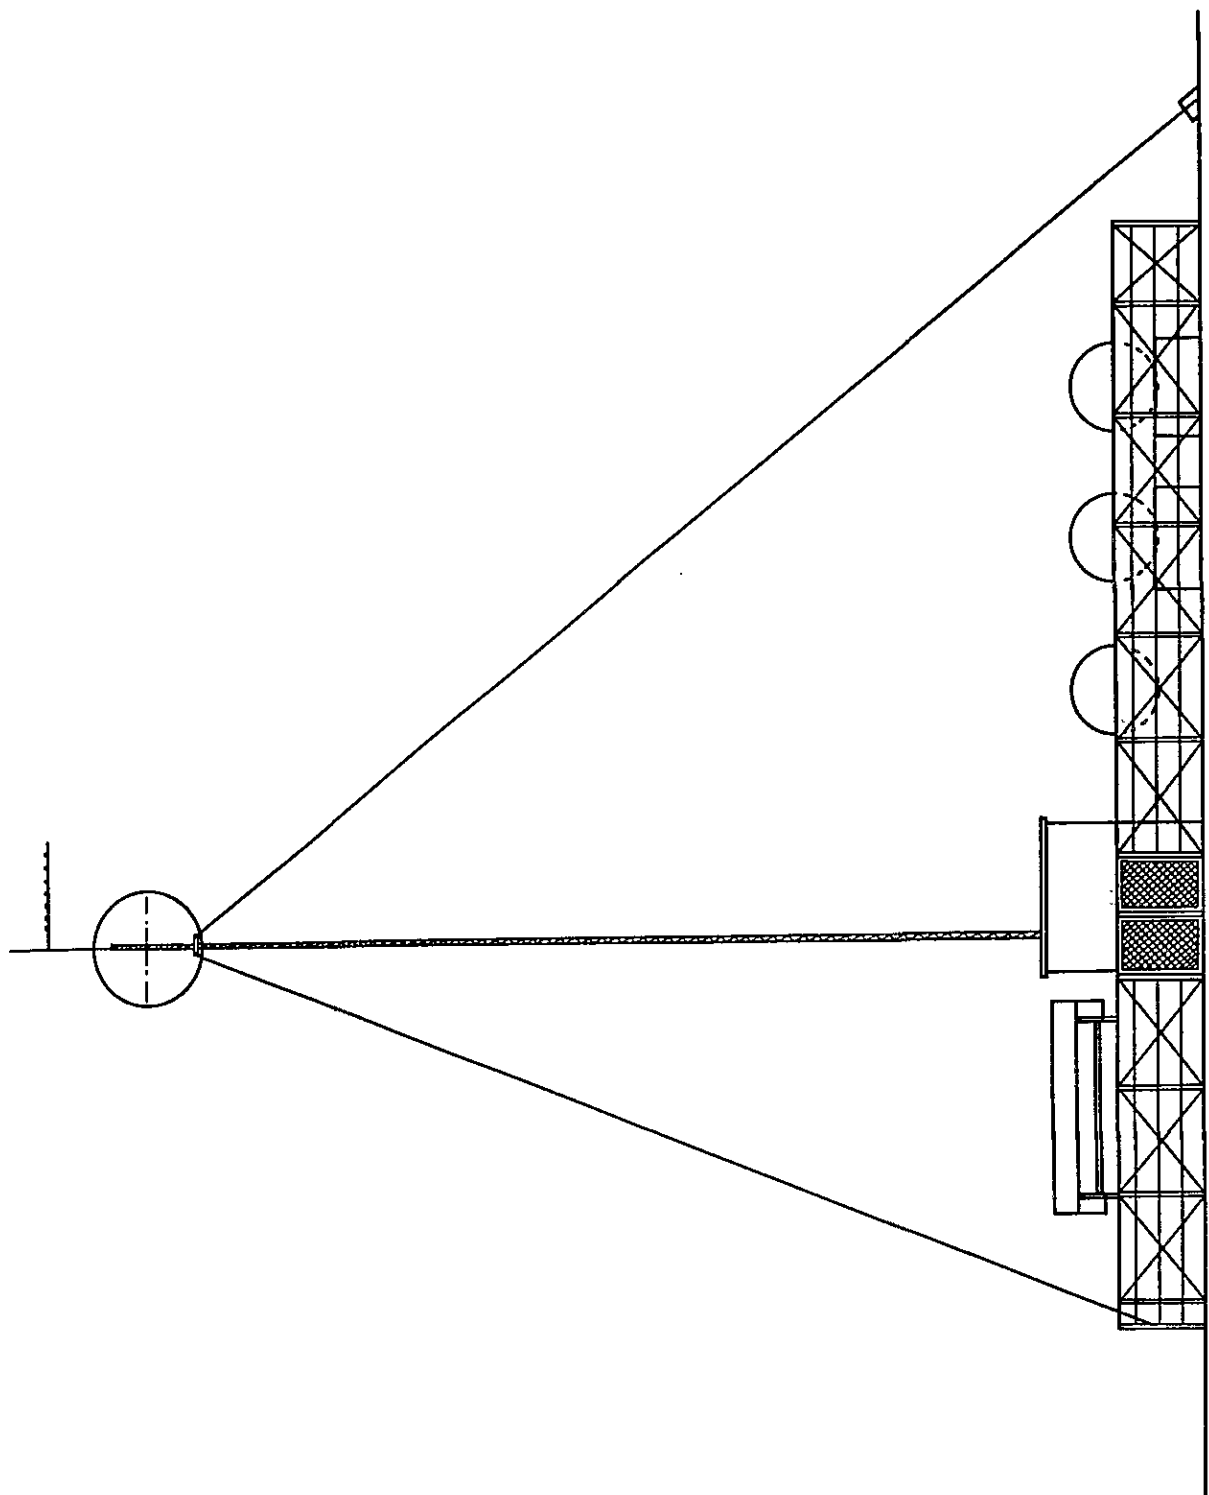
Typical Site Layout for UHF Repeater (2/2)
